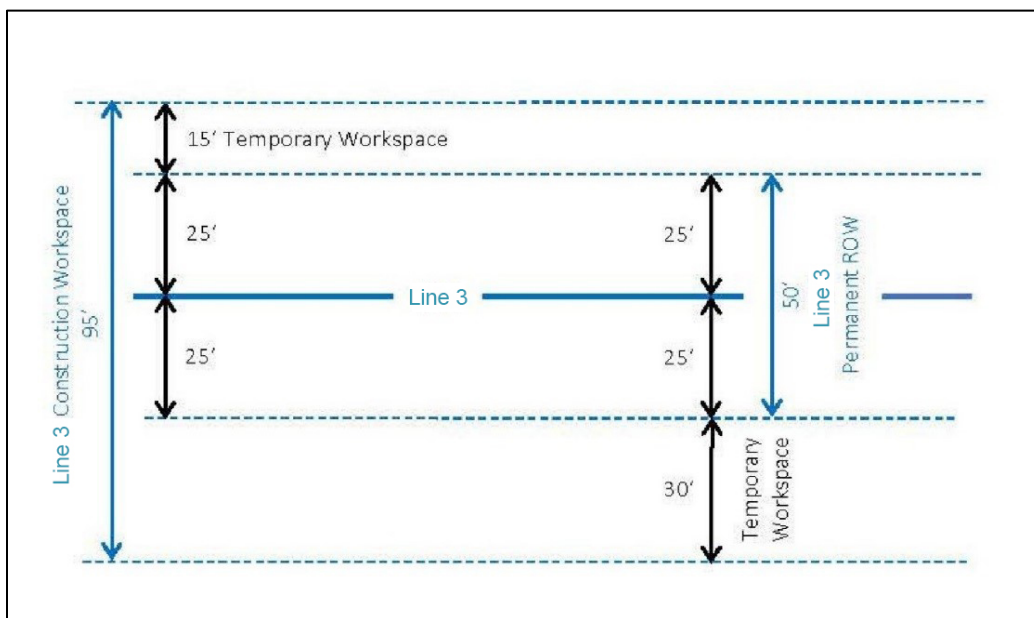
Plan View – Permanent Right-of-Way and Construction Work Area for the Proposed Line 3 Pipeline Route not Co-Located with Other Facilities in Wetlands
